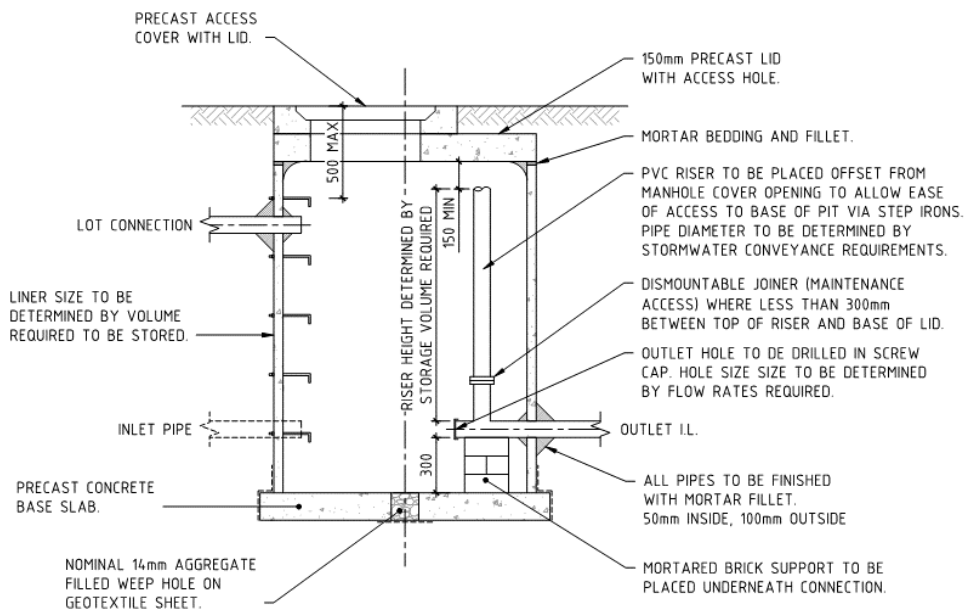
UNDERGROUND STORAGE PIT EXAMPLE
